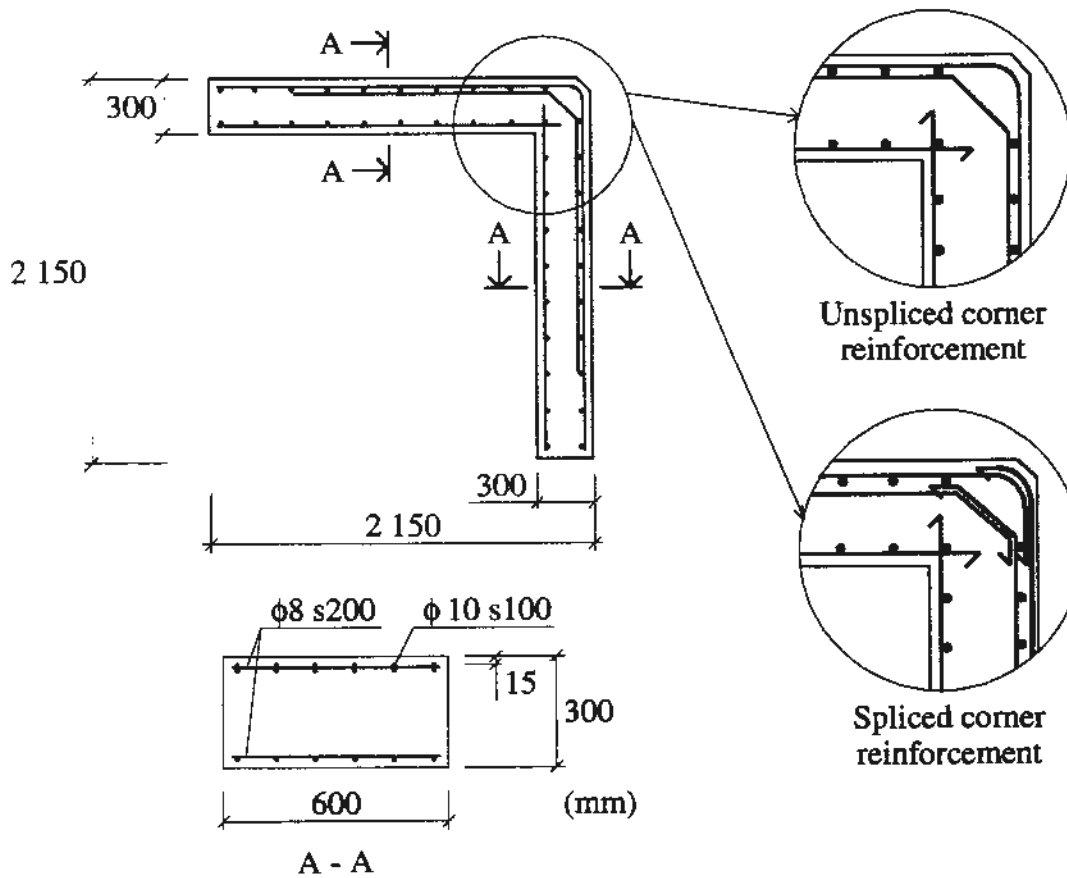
Dimensions and detailing for the first five specimens in the fatigue tests (no. B0 - B4).
